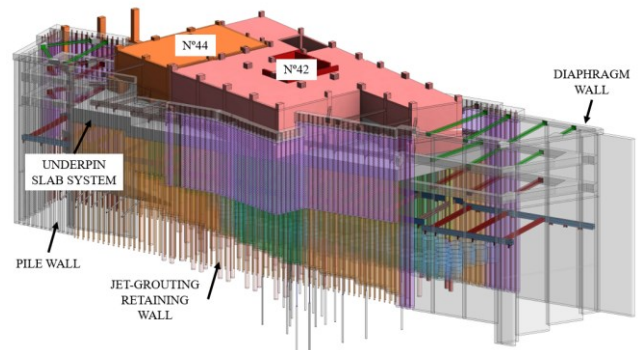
3D view: Cut&Cover excavation and underpinning solution.
